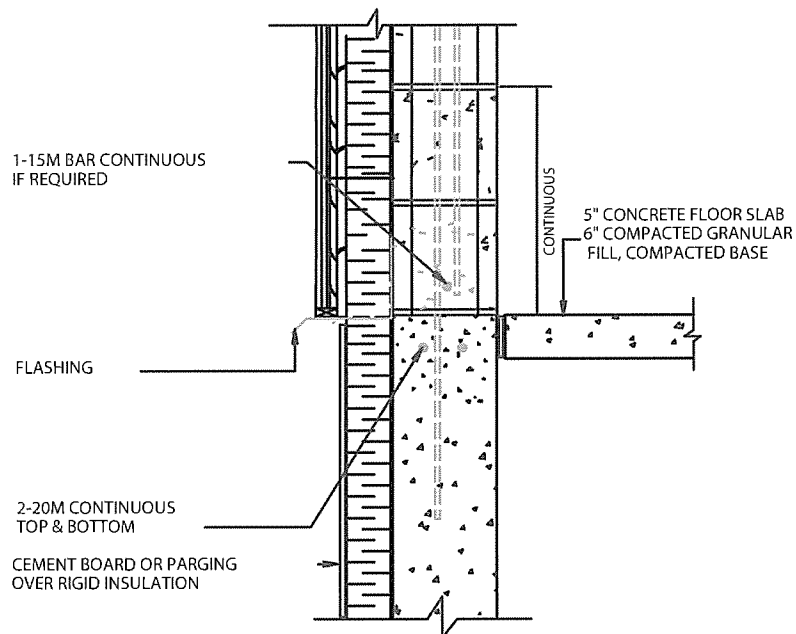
ACRYLIC STUCCO/ CONCRETE BLOCK
